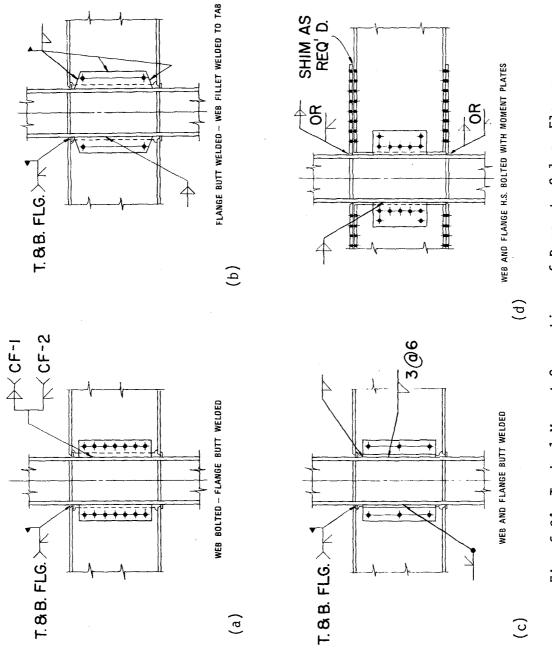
Typical Moment Connections of Beams to Column Flanges (reproduced with permission of AISC-SSEC).
